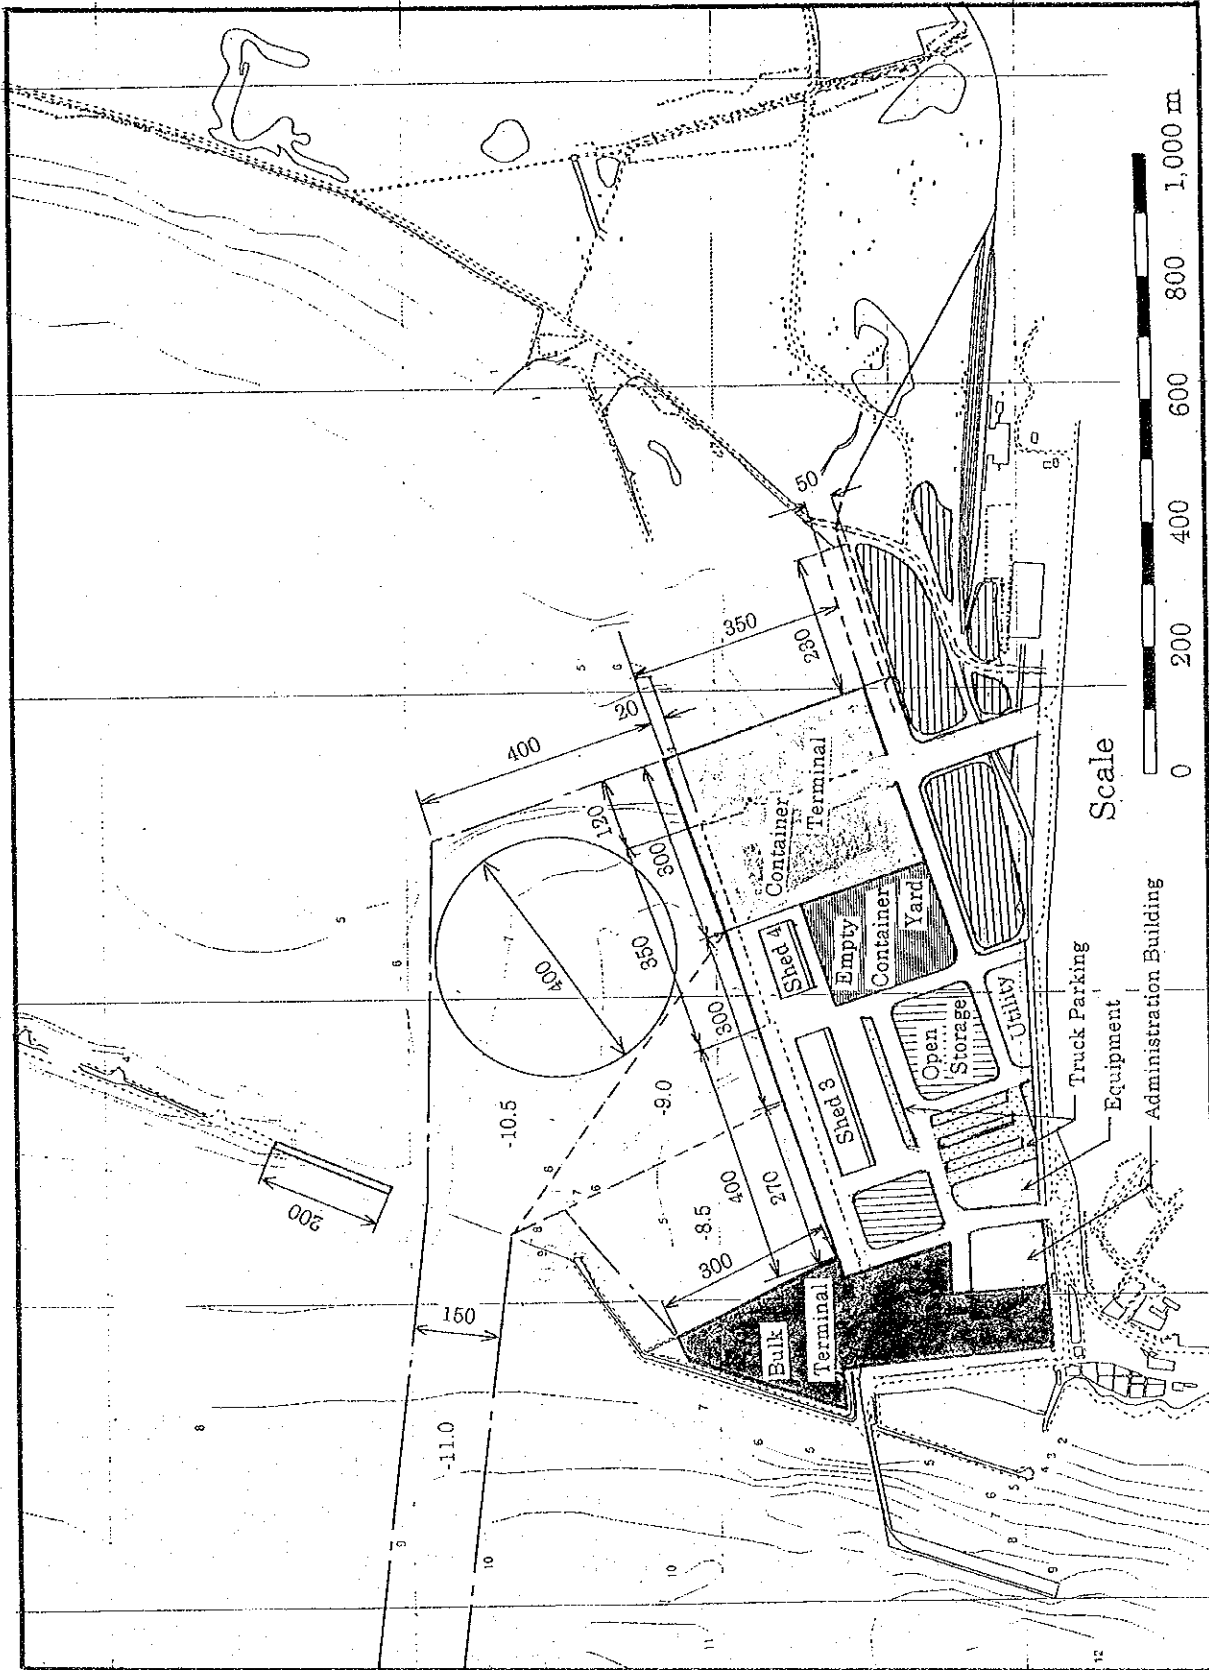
The Long-term Development Plan (Low Cases, Plan - 2)
